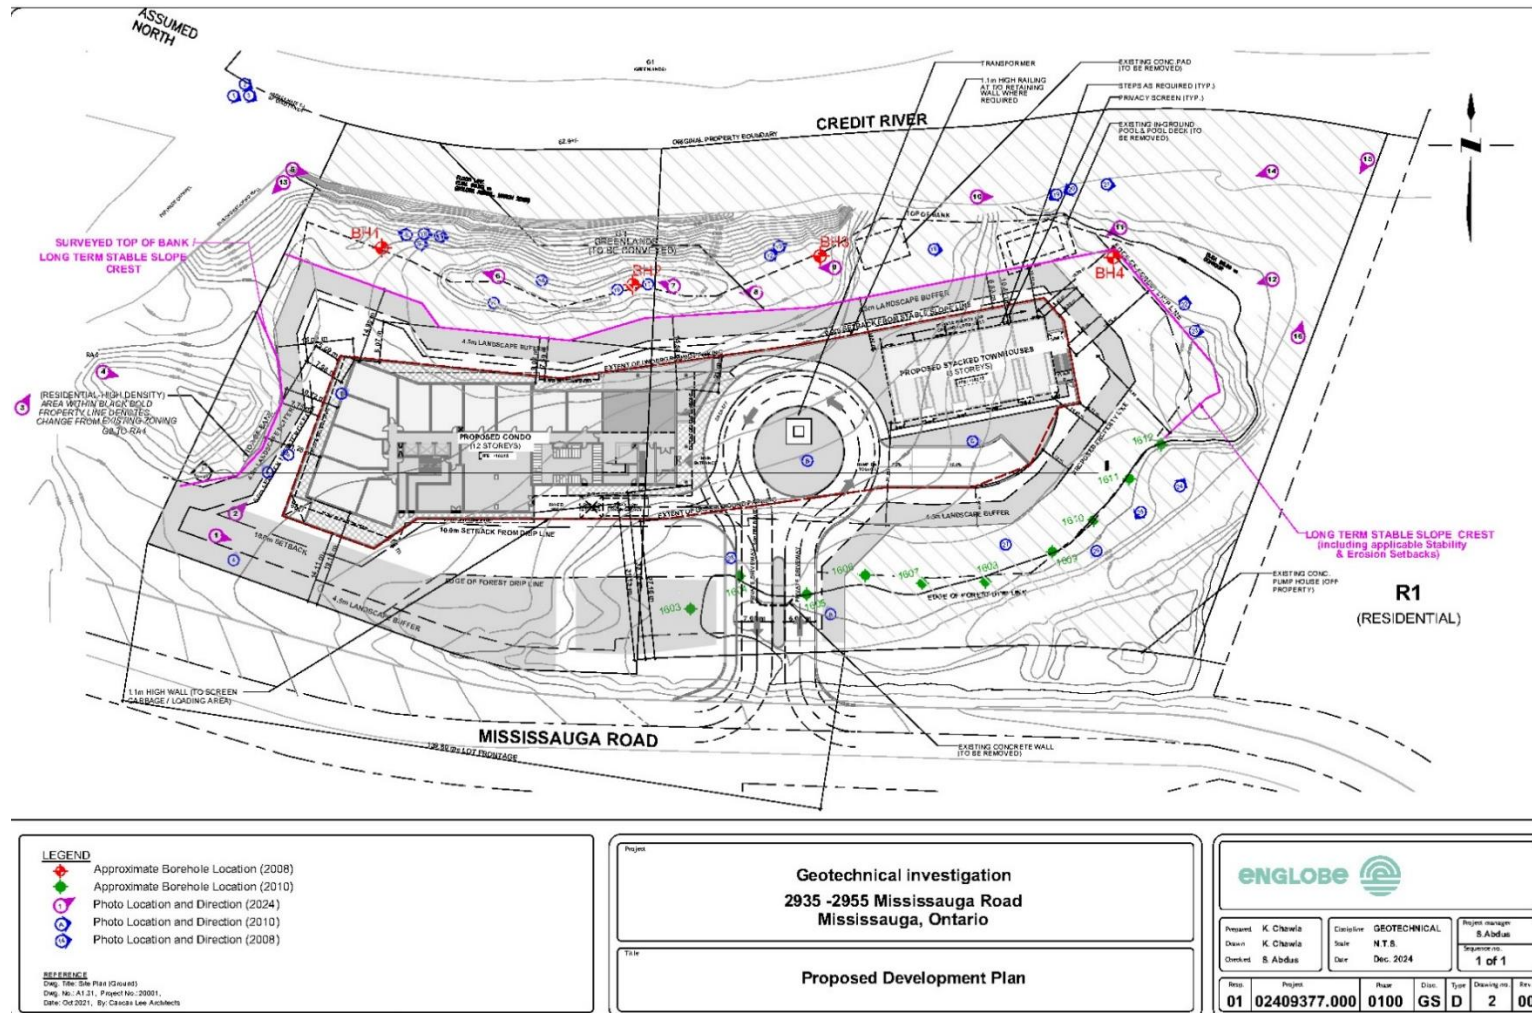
Geotechnical investigation plan showing the extant site topography and the long-term stable slope crest of the geological formation on the north side of the site (in pink) (Englobe Corporation, 2024)
